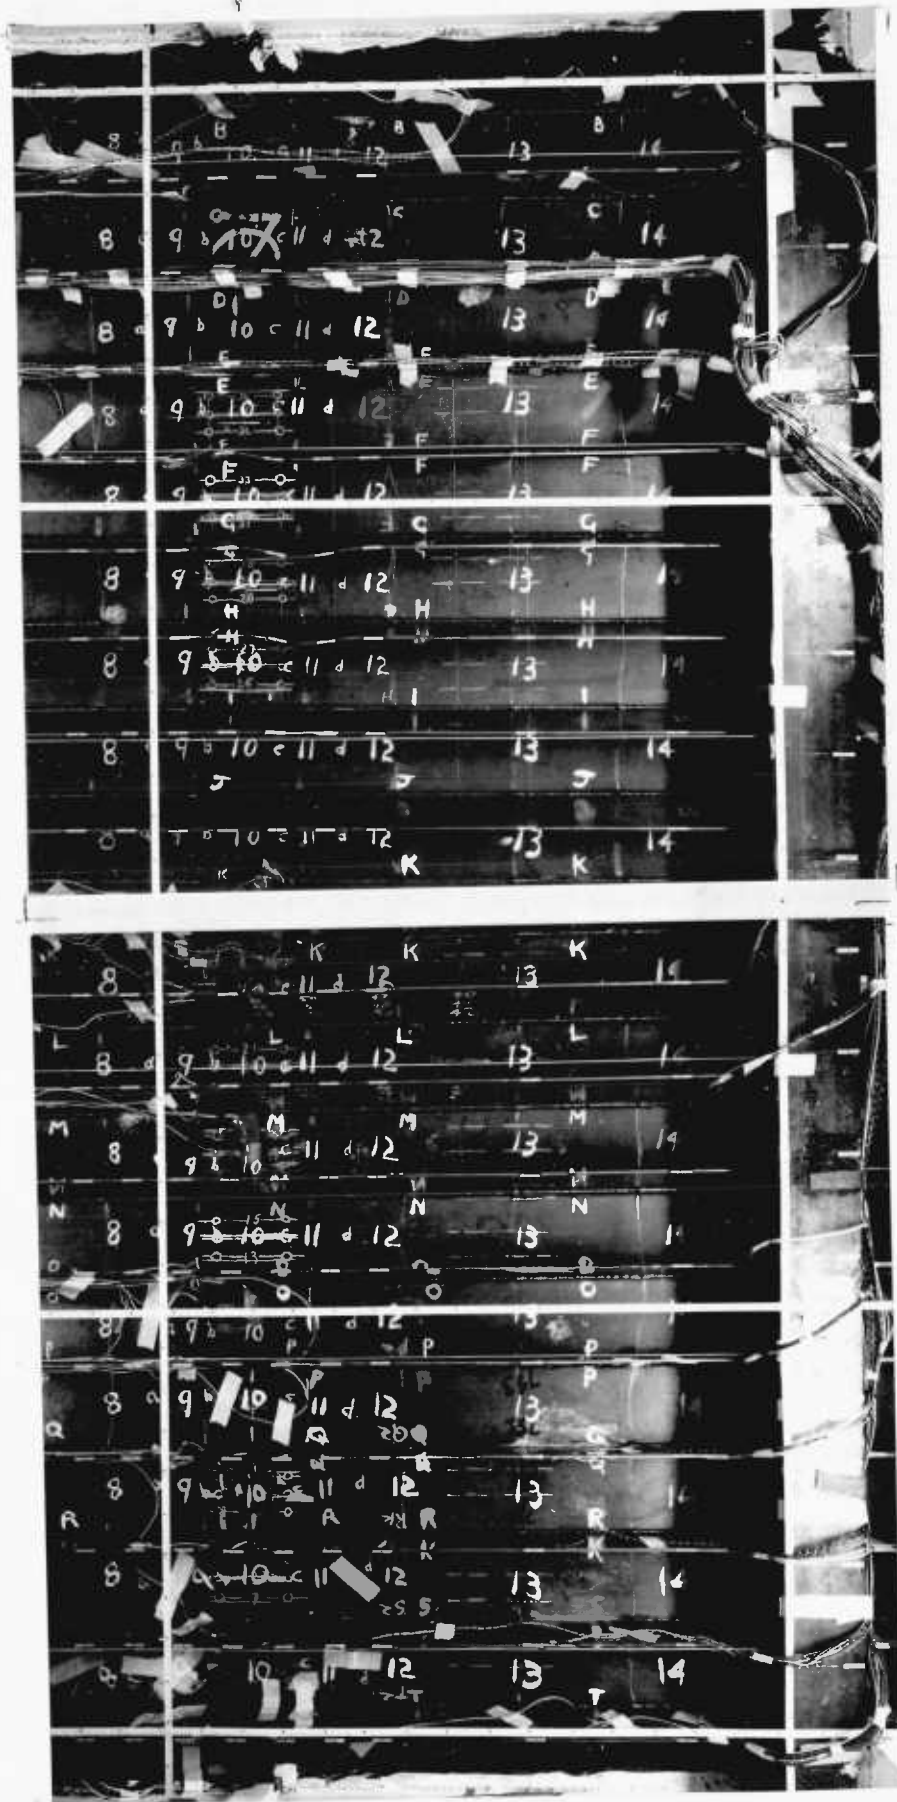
Model 12 - view of underside of central bay showing failure of stiffeners F, G and H (Test 12C - at 4440 kN point load)
